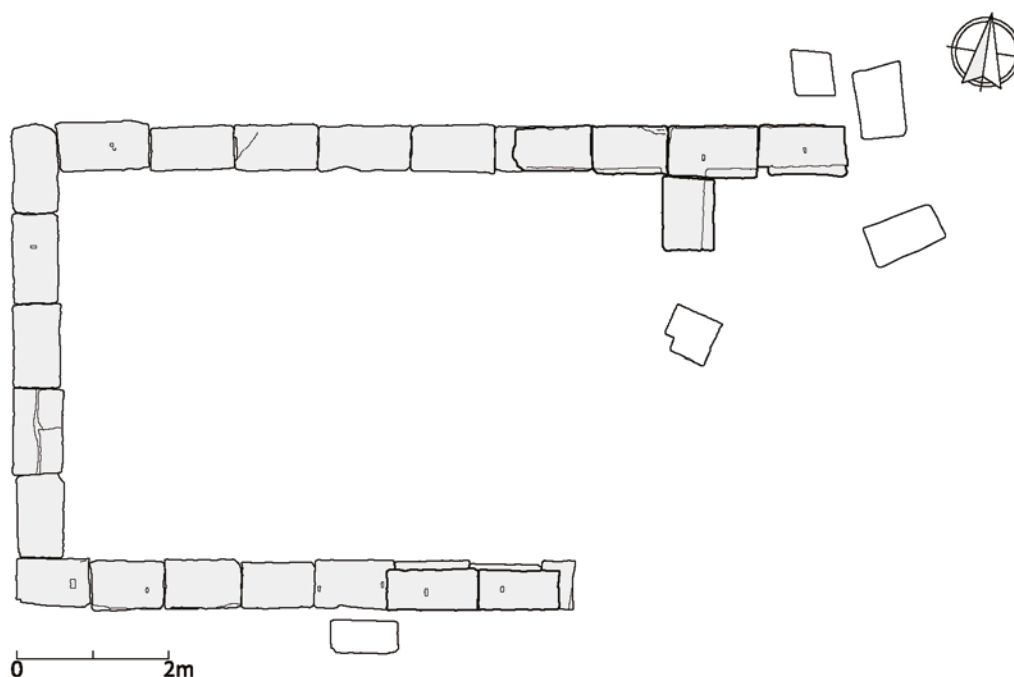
Plan of building remains of the naiskos inside foundations of temple G.
